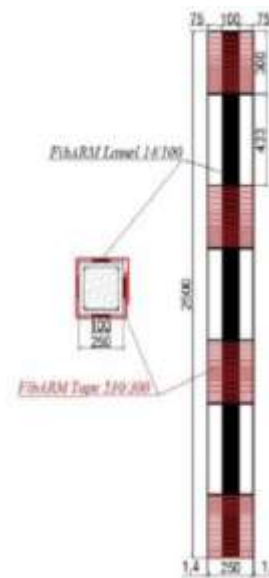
Reinforcement of a column of group B with lamellas and collars (source [5])
